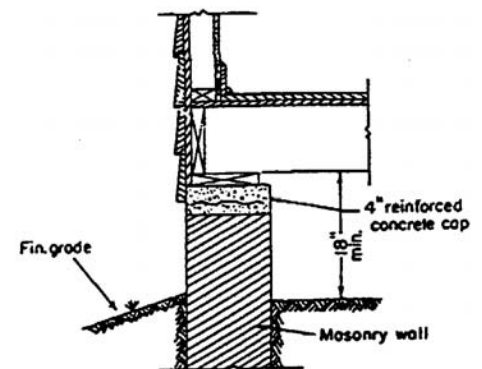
A reinforced poured concrete cap on masonry walls or pier.
